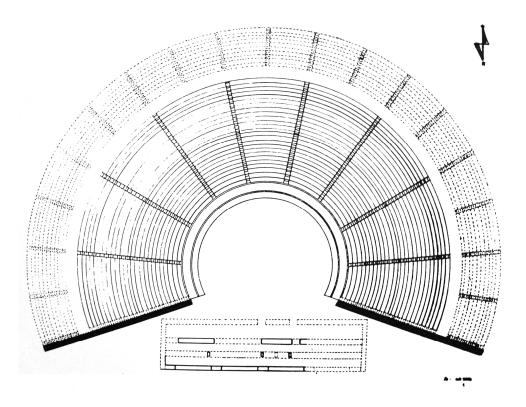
Plan layout of theatre (Archeological excavation reports)
